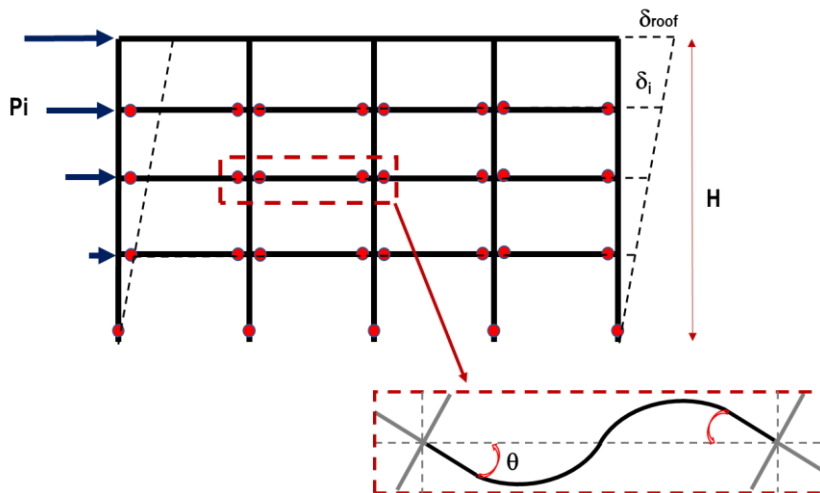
Collapse mechanism and vertical distribution load assumed.
